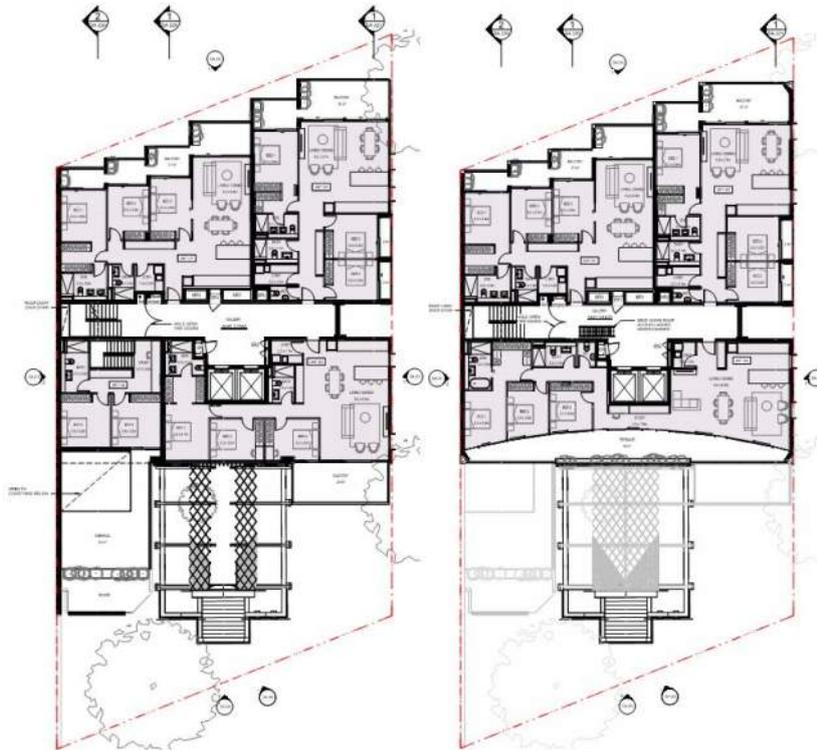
Level 2 Plan (left), and Level 3 Plan (right).
